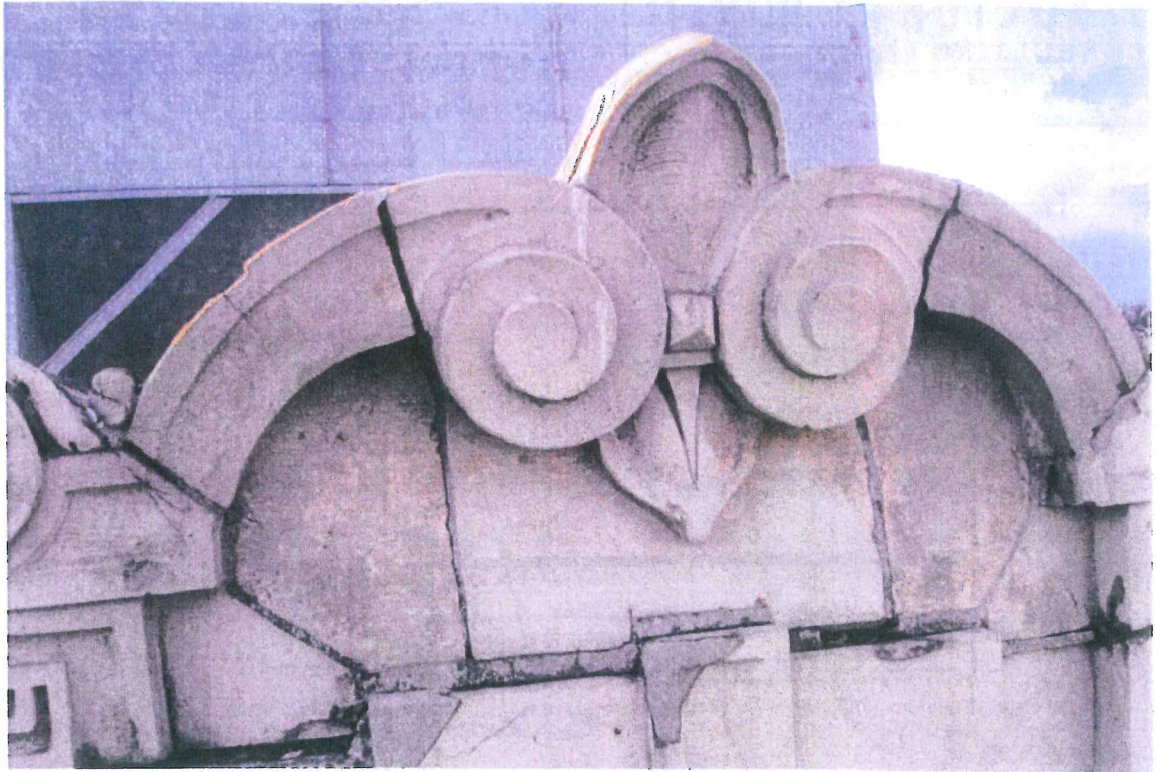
Detail of parapet cartouche. Structures North, Dec 2009.
